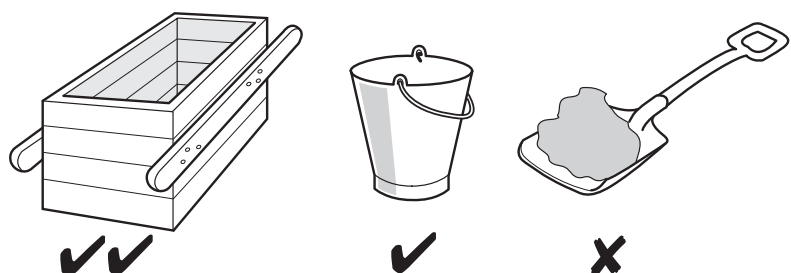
When volume batching, gauge boxes are best, buckets are second best and shovels are not good enough
